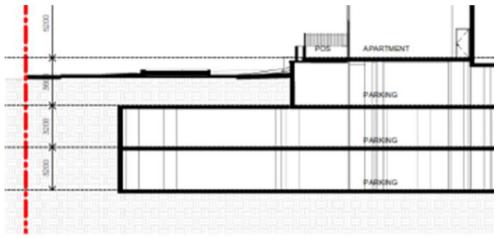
Section of proposed layout of basement Levels 2 and 3 for DA-2024/190, including a 3.6 metre soil depth above Level 2 to the proposed ground level of the open space
